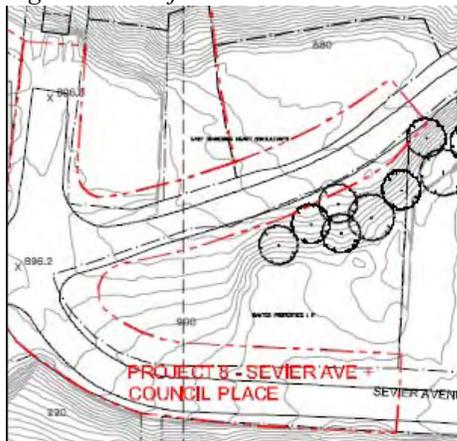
Project 8 – Sevier Avenue and Council Place Enhancement (eastern section).
